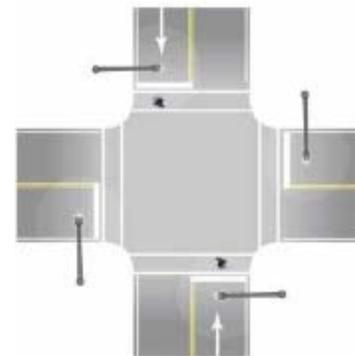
Drawing. New design for intersection lighting layout for crosswalks.
